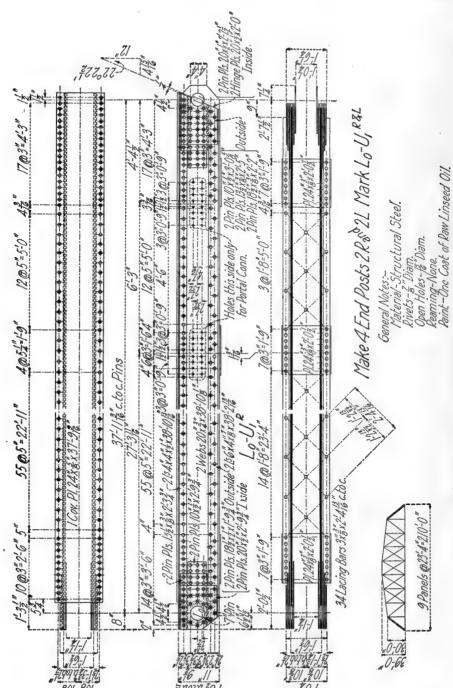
SHOP DETAILS OF END-POST OF A TRUSS BRIDGE.
